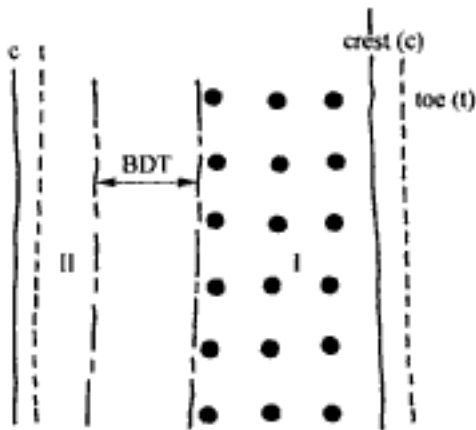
Plan view showing actual blast damage zone (BDT).
